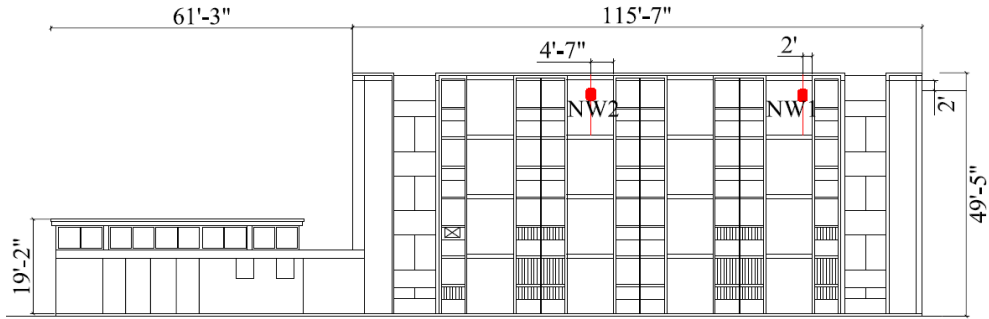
North-west elevation of HB Building with driving rain gauge locations
